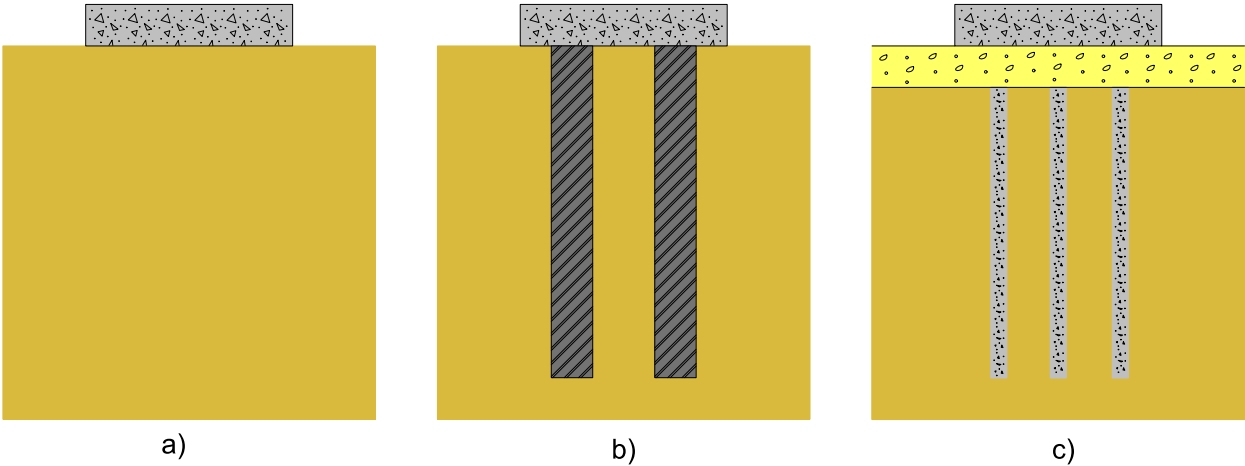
a) Shallow foundation, b) deep foundation and c) stiff column-supported shallow foundation (after ASIRI 2012).
